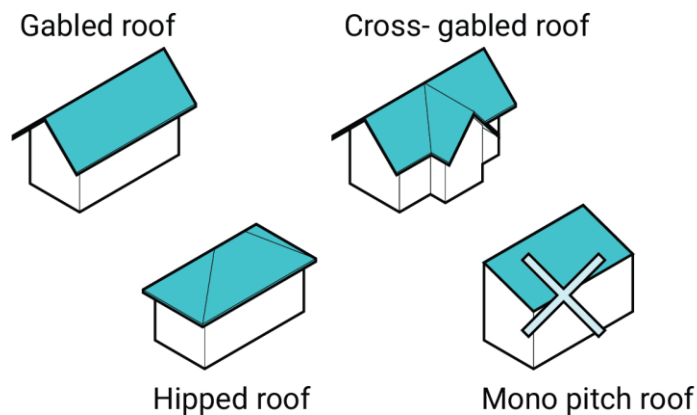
(B)(3)(e)(ii): Roof types — VMU District
